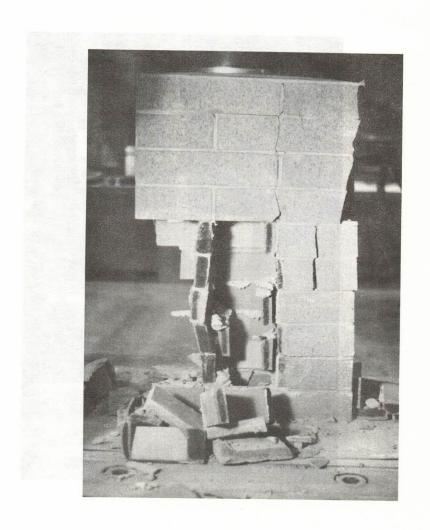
MONARCH SPECIMEN AFTER FAILURE
